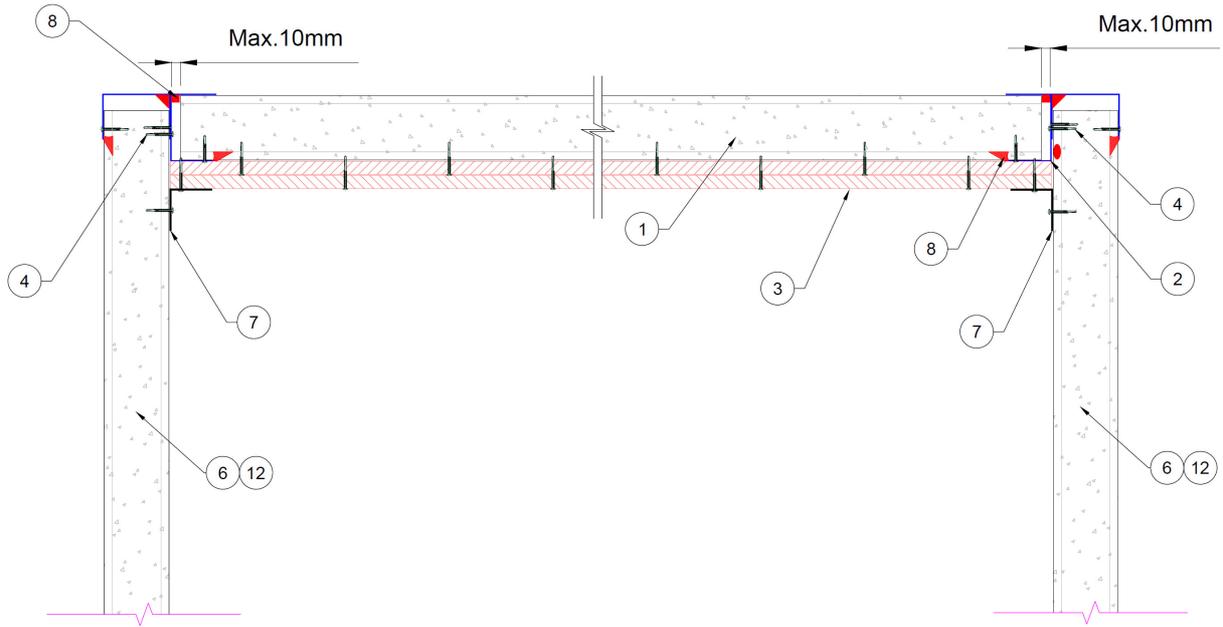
Speedpanel ceiling protected with plasterboard lining (Longitudinal Section View)
